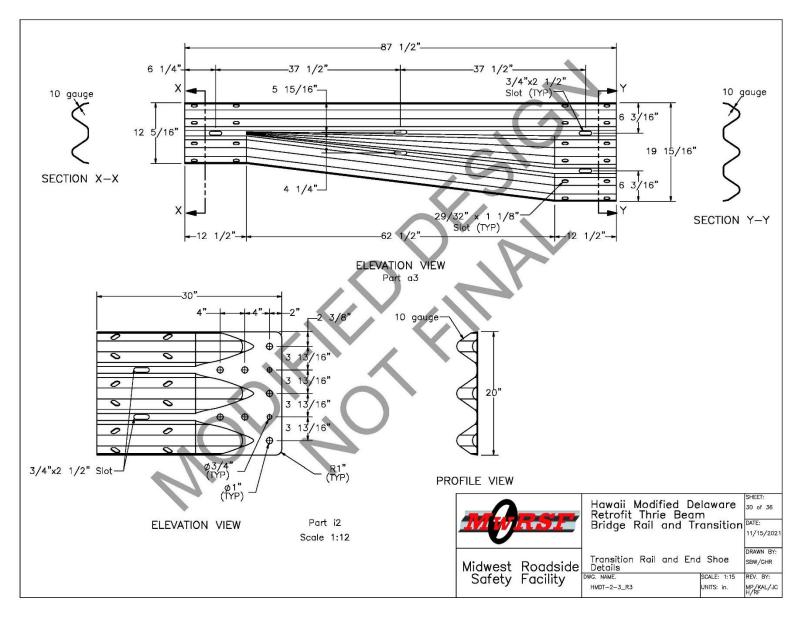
Transition Rail and End Shoe Details, Test Nos. HMDT-2 and HMDT-3
